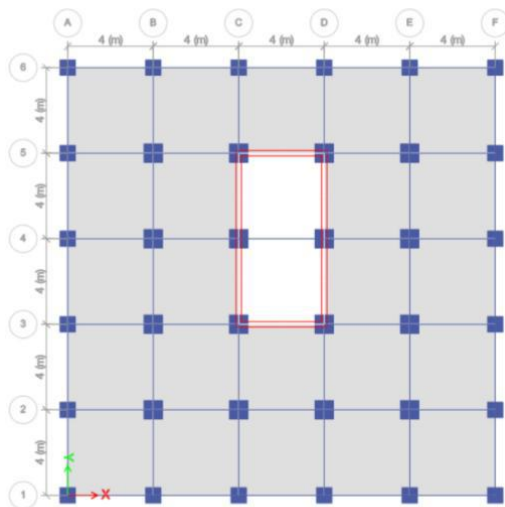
Typical floor plan of the G+25 building, showing the column grid and central shear wall core.
